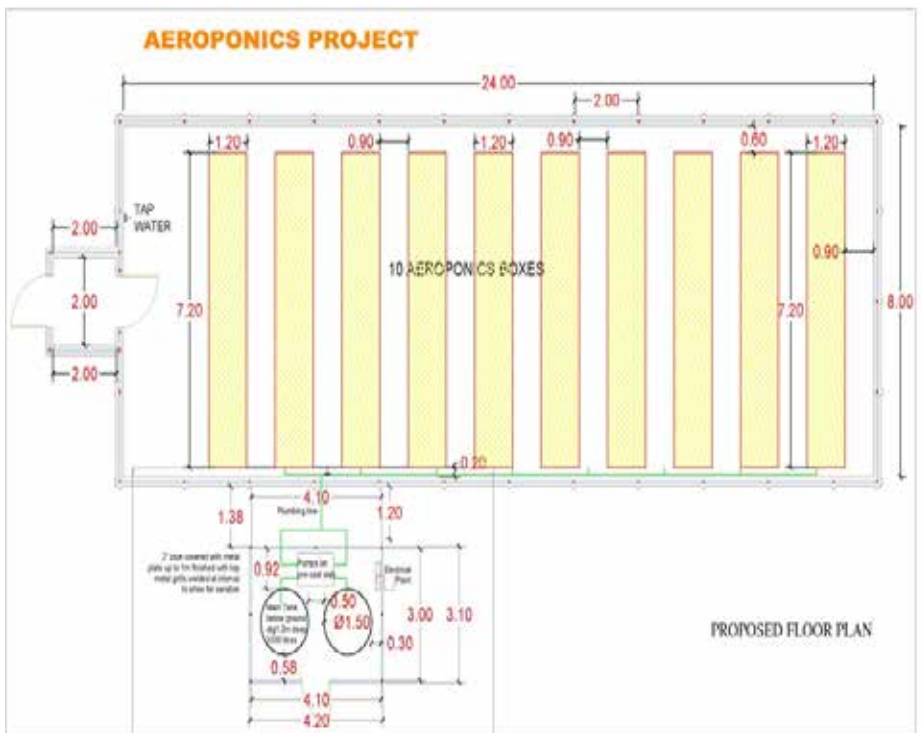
Schematic drawing view of AS boxes in screenhouse and the adjacent power house.
